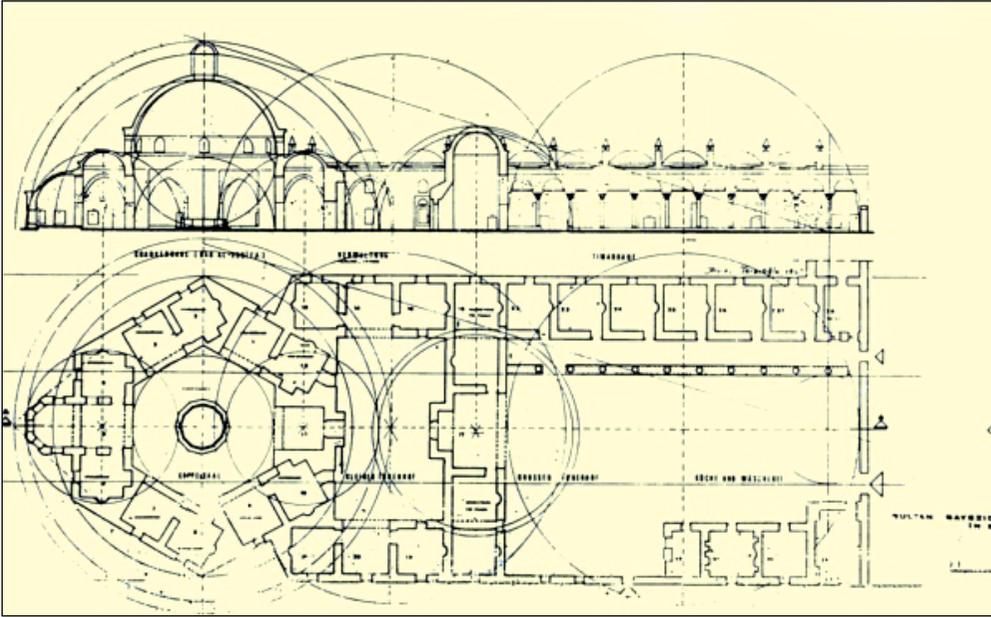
Plan 14- Geometric proportions and acoustic plan of the Hospital (Arslan Terzioğlu).
